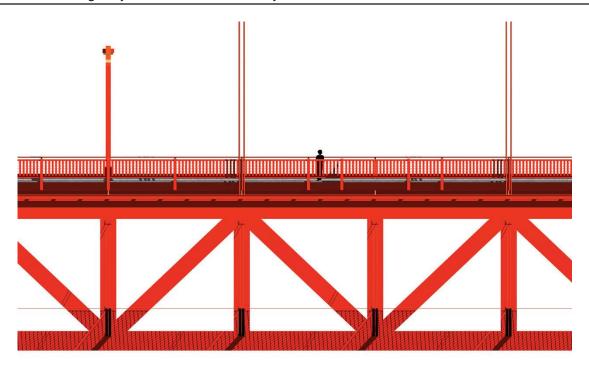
ALTERNATIVE 2B: ELEVATION AT ACCESS GATES
